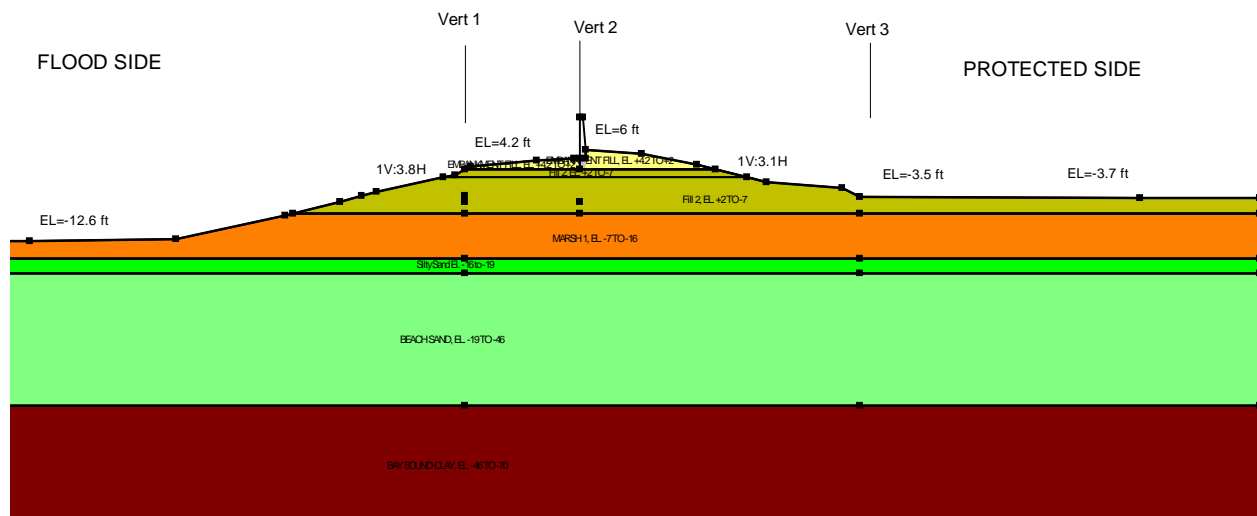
Geo-Studio model for 17th Street Outfall Canal Reach 14
